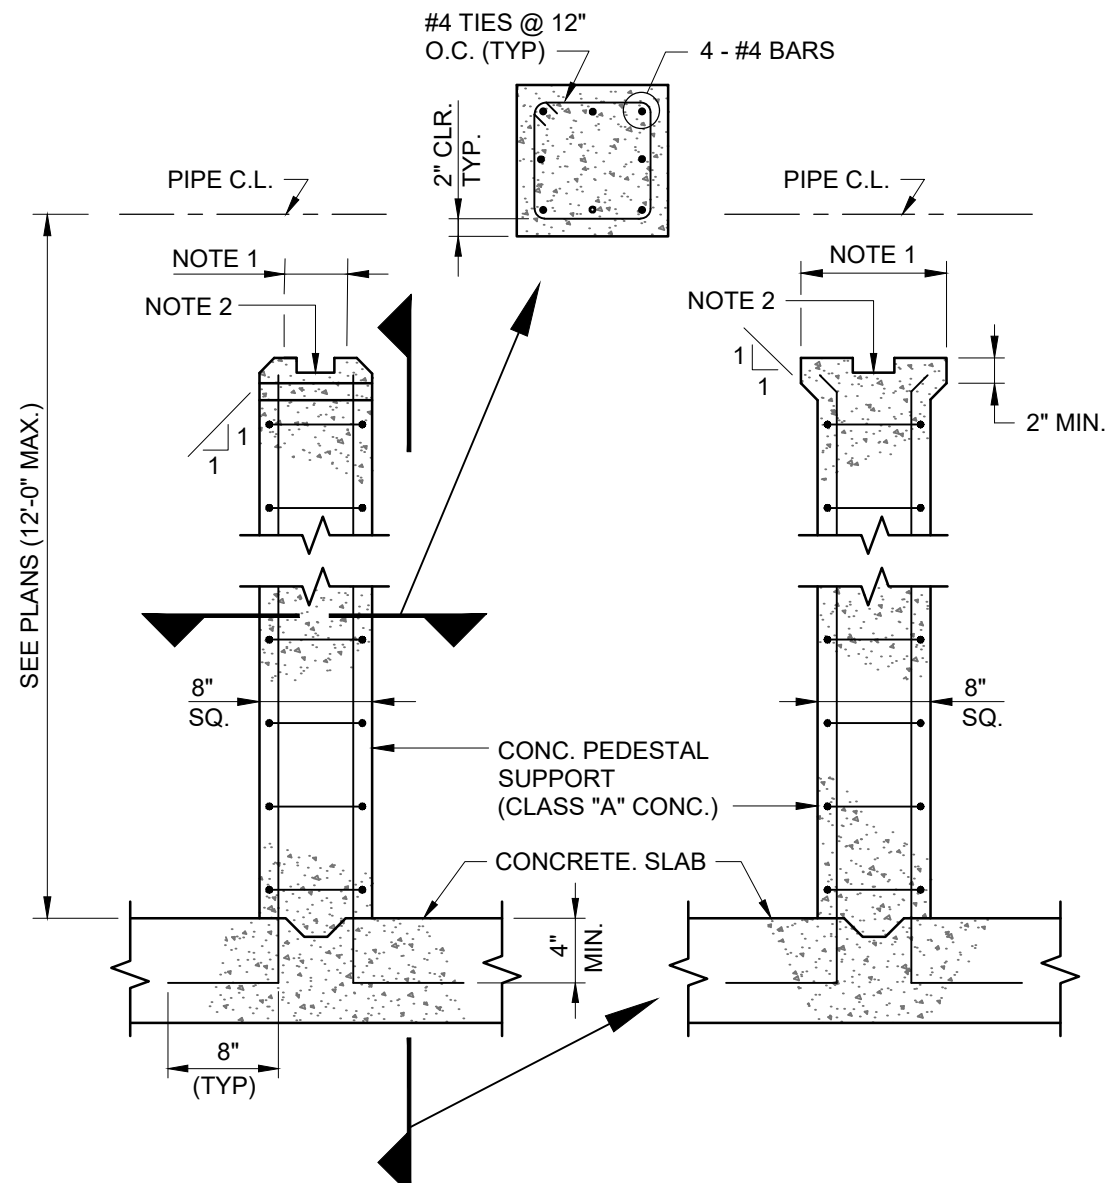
DETAIL A - AT MH OPENING DETAIL B - IN PIPE OR AT MH INVERT
